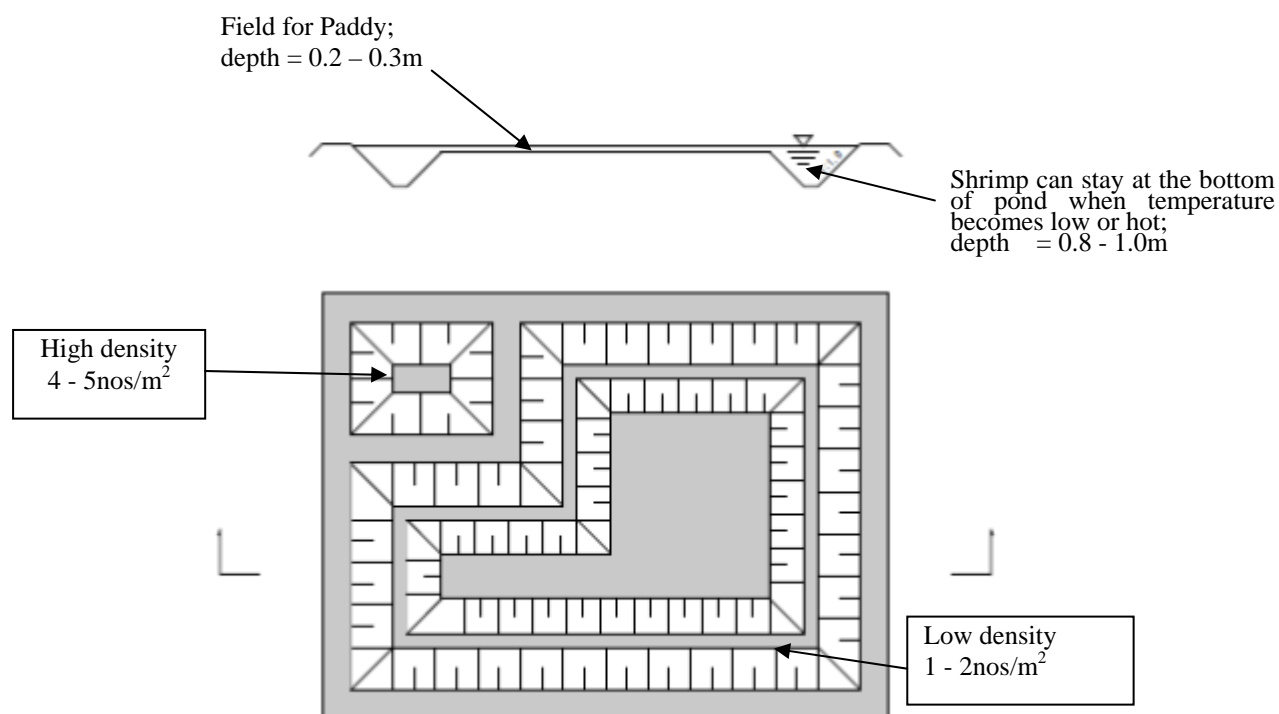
Typical Cross Section for Improved Extensive Shrimp Farming (up) and Plan (below)
